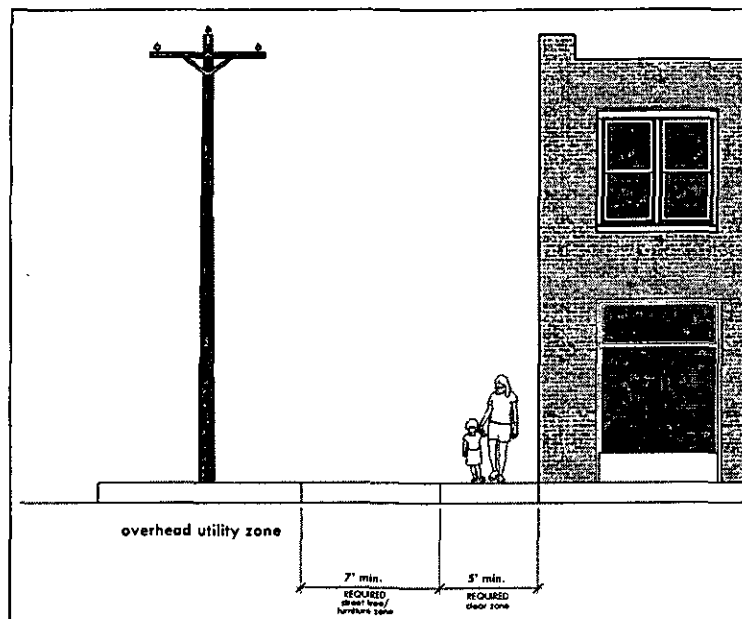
Above-Ground Utilities at Curb on Urban Roadway
